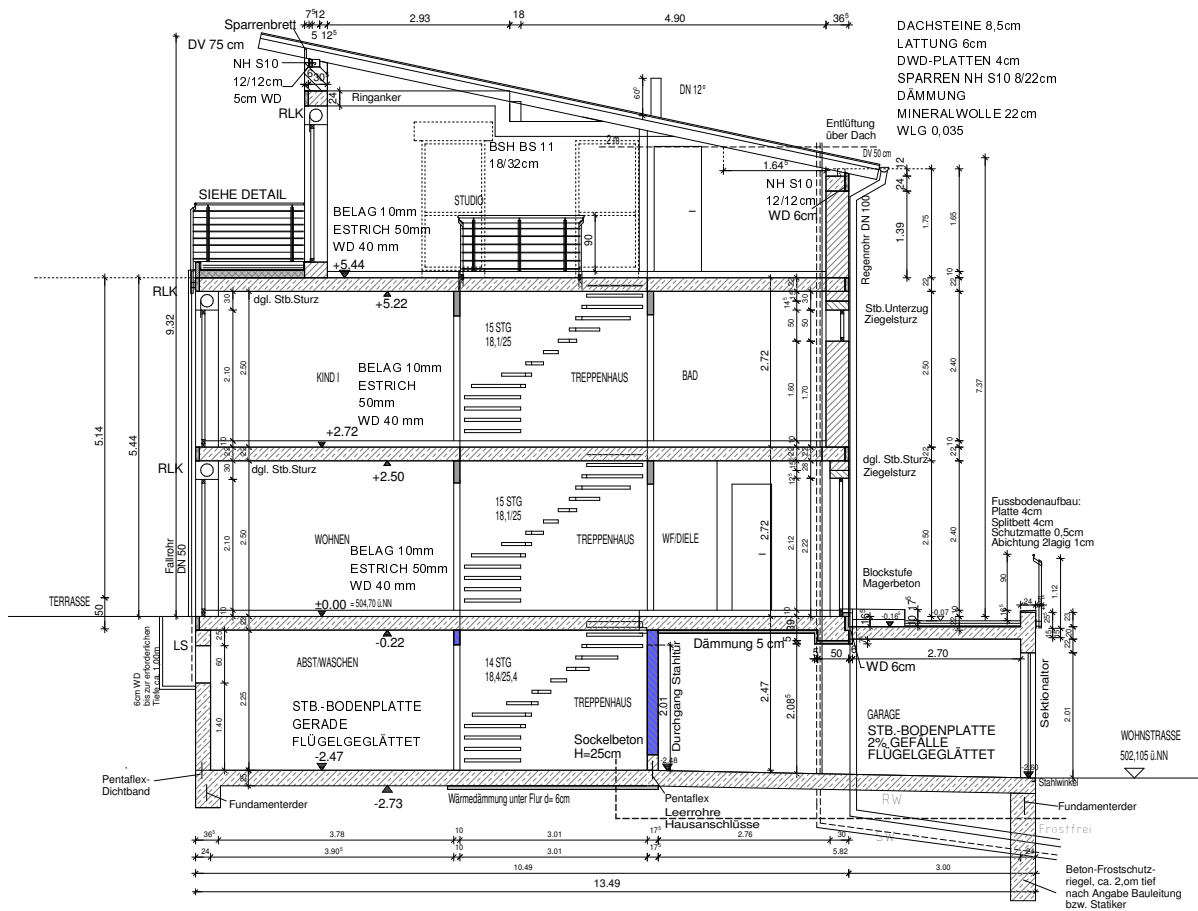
Row house building section. The north façade has a setback at the roof level creating a terrace [148].
